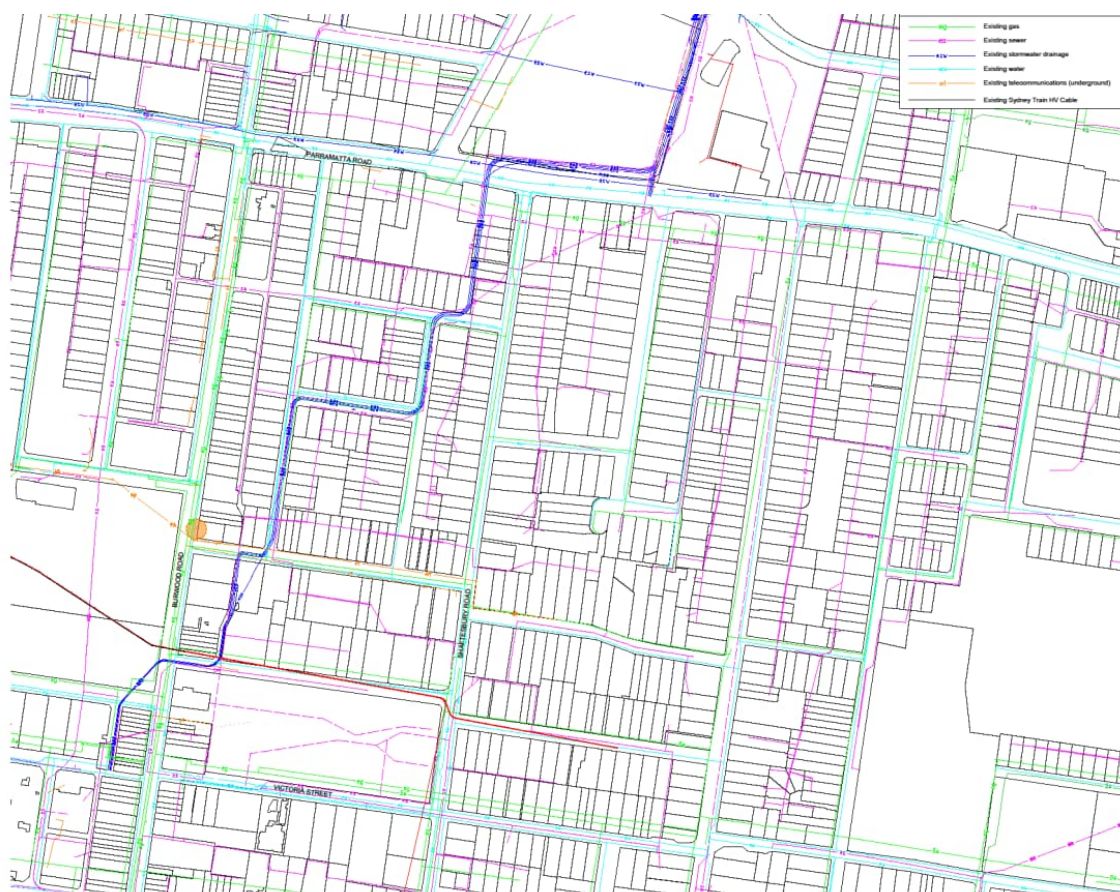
Existing utilities plan indicating trunk stormwater route
